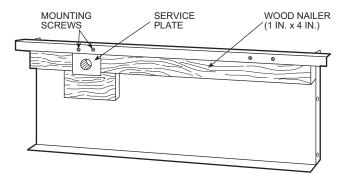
Installed Thru-the-Curb Gas Service Plate
